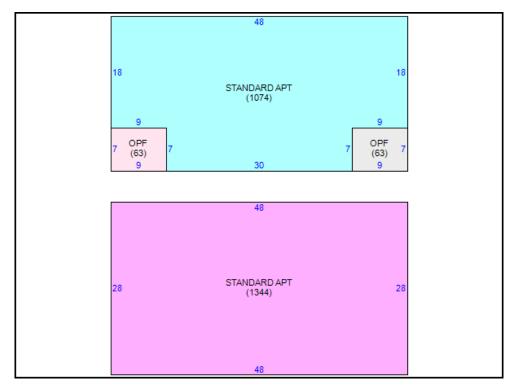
Standard two-story duplex apartment plan (Leon County Property Appraiser 2020).
